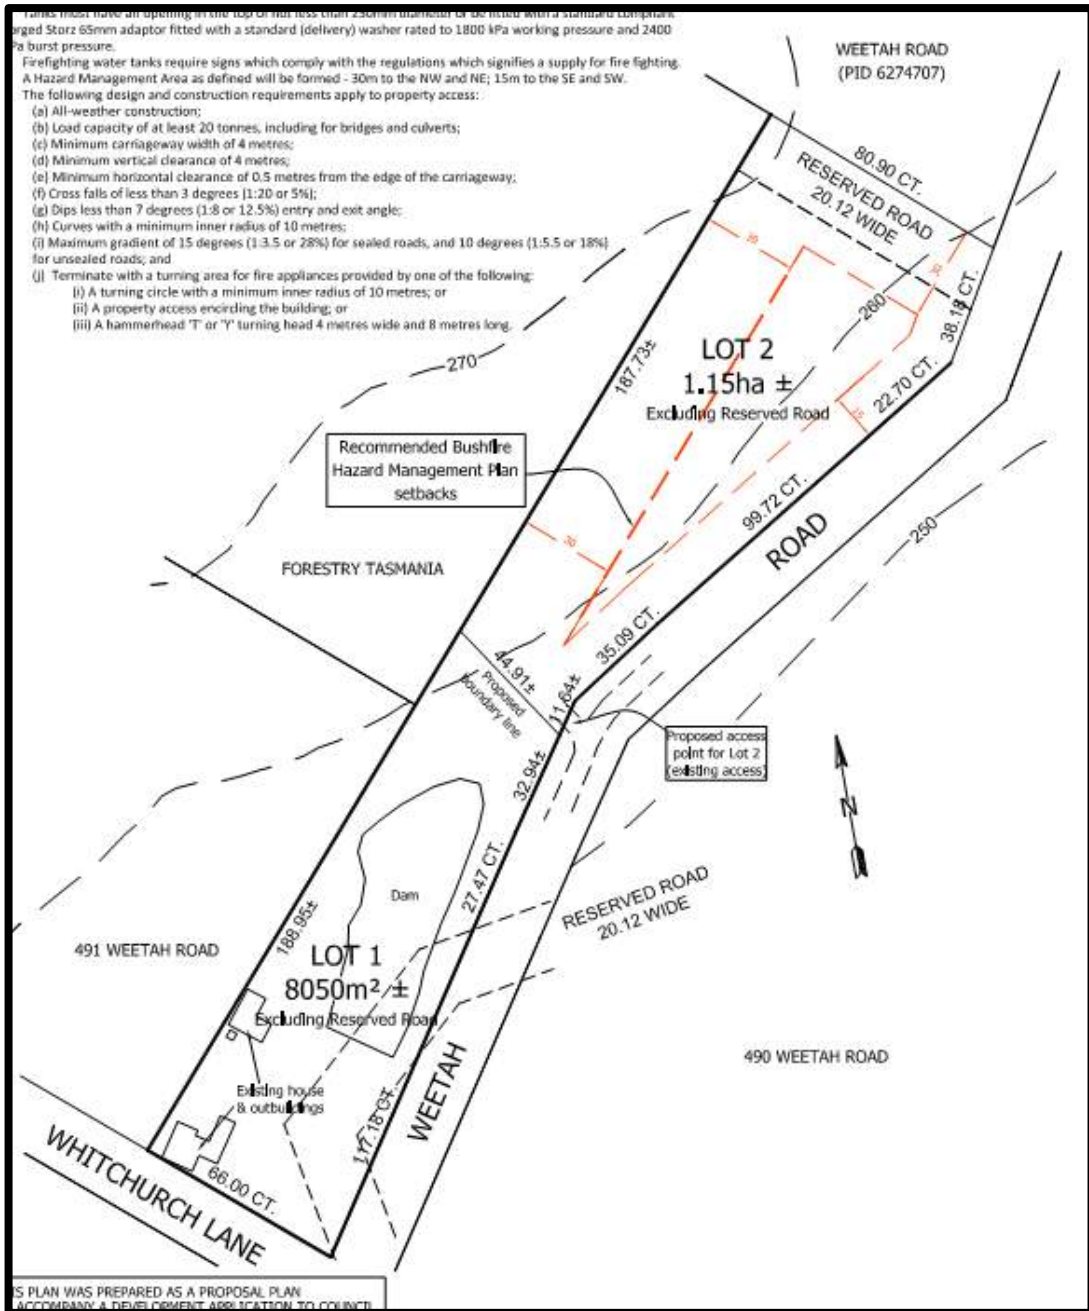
proposed Plan of Subdivision (Woolcott Surveys, 2017)
